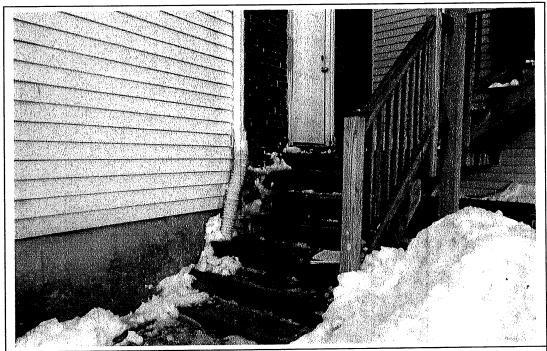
0116 1723.jpg 8 Alder Street: Bottom stair with downspout and ice buildup.
